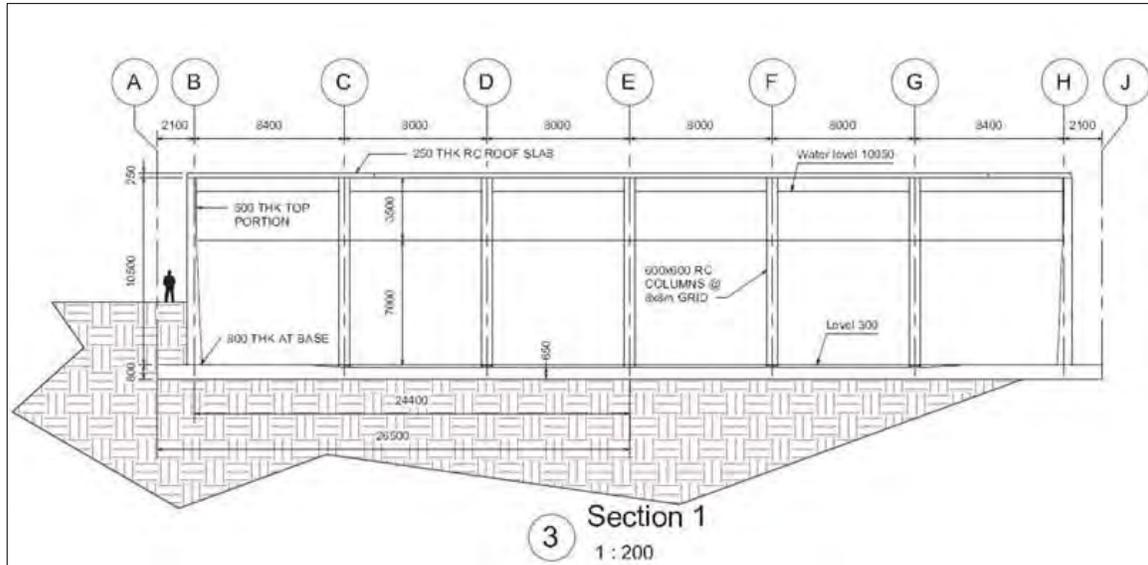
Detail showing sub-surface depth (~ 3.2m) to which the proposed construction will extend
